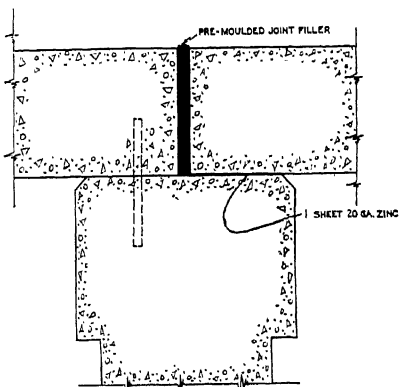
Expansion Joint Device—Slab Type Thick Floor.
